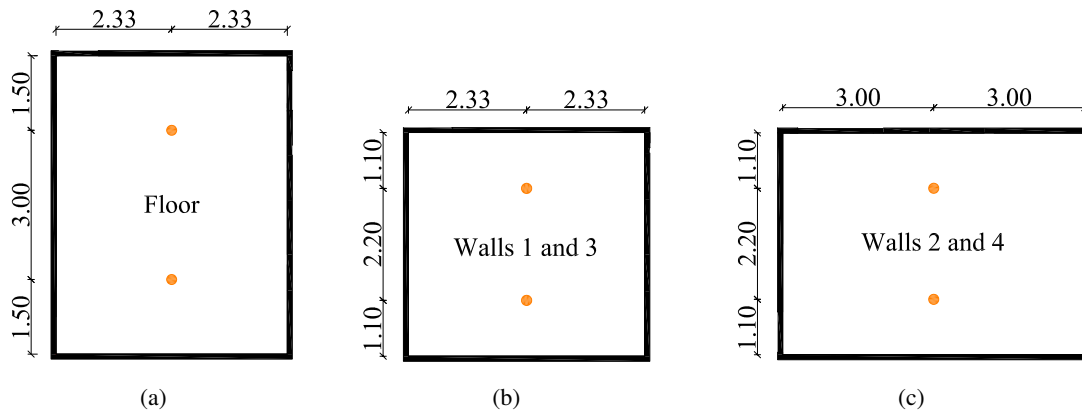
Thin thermocouples located on a) floor, b) Wall 1 and Wall 3, c) Wall 2 and Wall 4.
